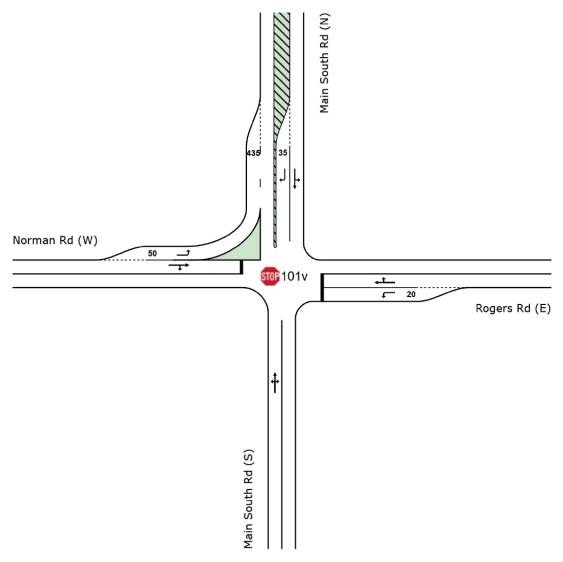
A concept of the Main South Road, Norman Road and Rogers Road intersection upgrade
